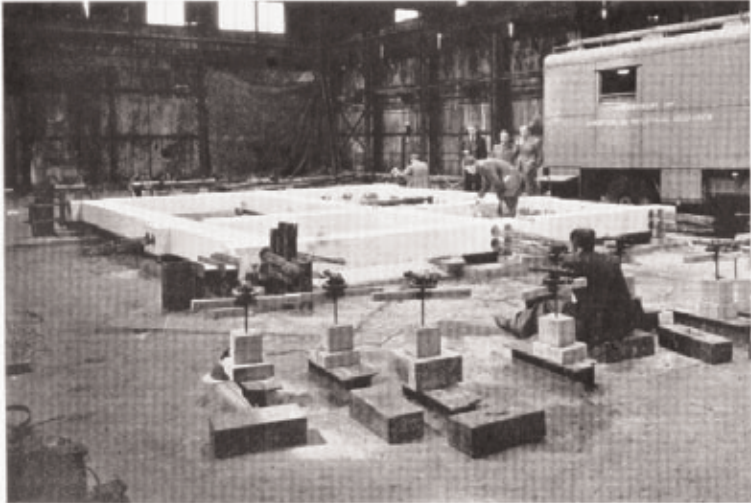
The frame shown resting on rollers and undergoing a load test.
